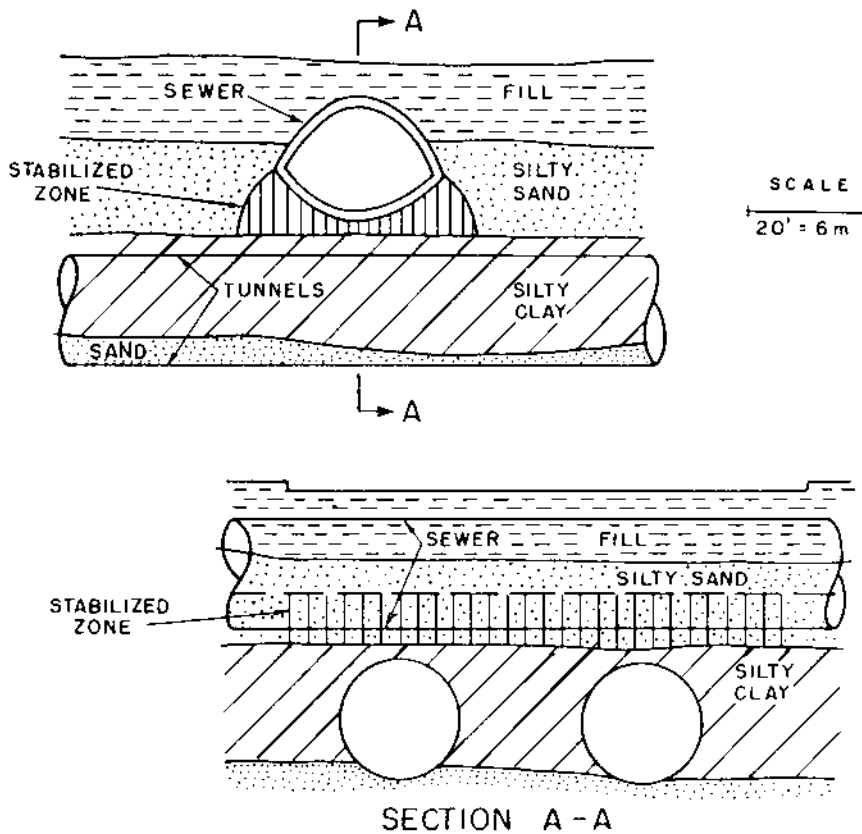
Elevation through culvert and tunnels. (From Ref. 8.)
